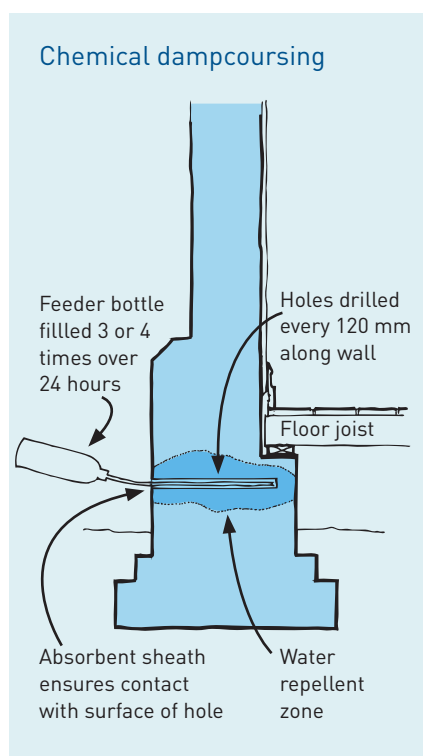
Chemical dampcoursing. Cross-section through a solid wall showing the gravity-fed system. Note that the new water-repellent zone should be installed below all floor timbers.
